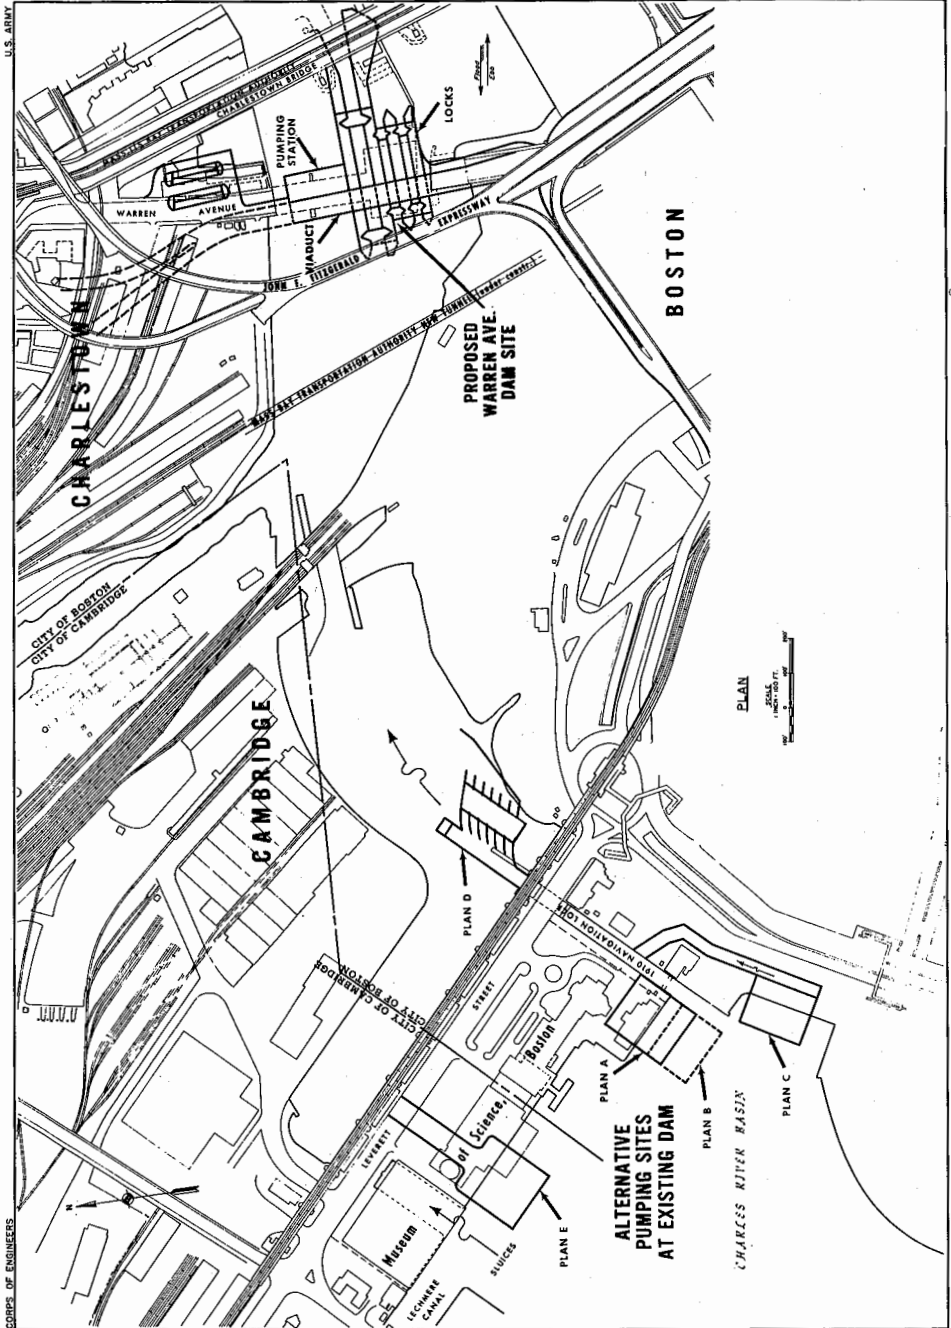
Alternative Project Sites at Existing Dam and at Warren Avenue.
